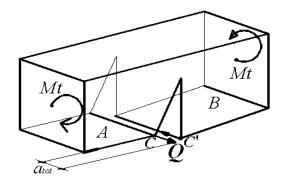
Scheme of a reinforced concrete element with a normal crack subjected to torsion.
